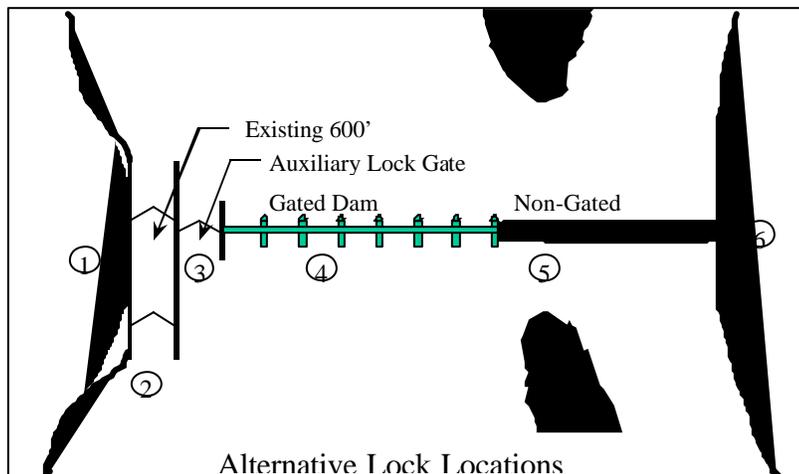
Example of alternative new lock locations at a typical existing lock and dam site.
